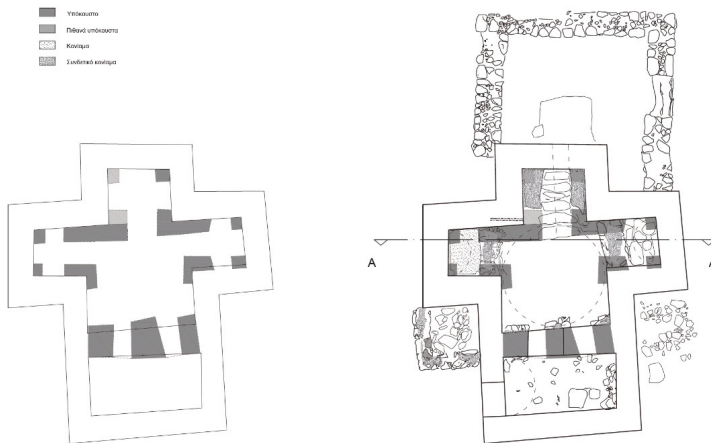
Two plans of Building B. The shaded area in the plan to the left represent the hypocaustal area, while the plan on the right includes adjacent structures. (Drawing: Th. Mangana).
